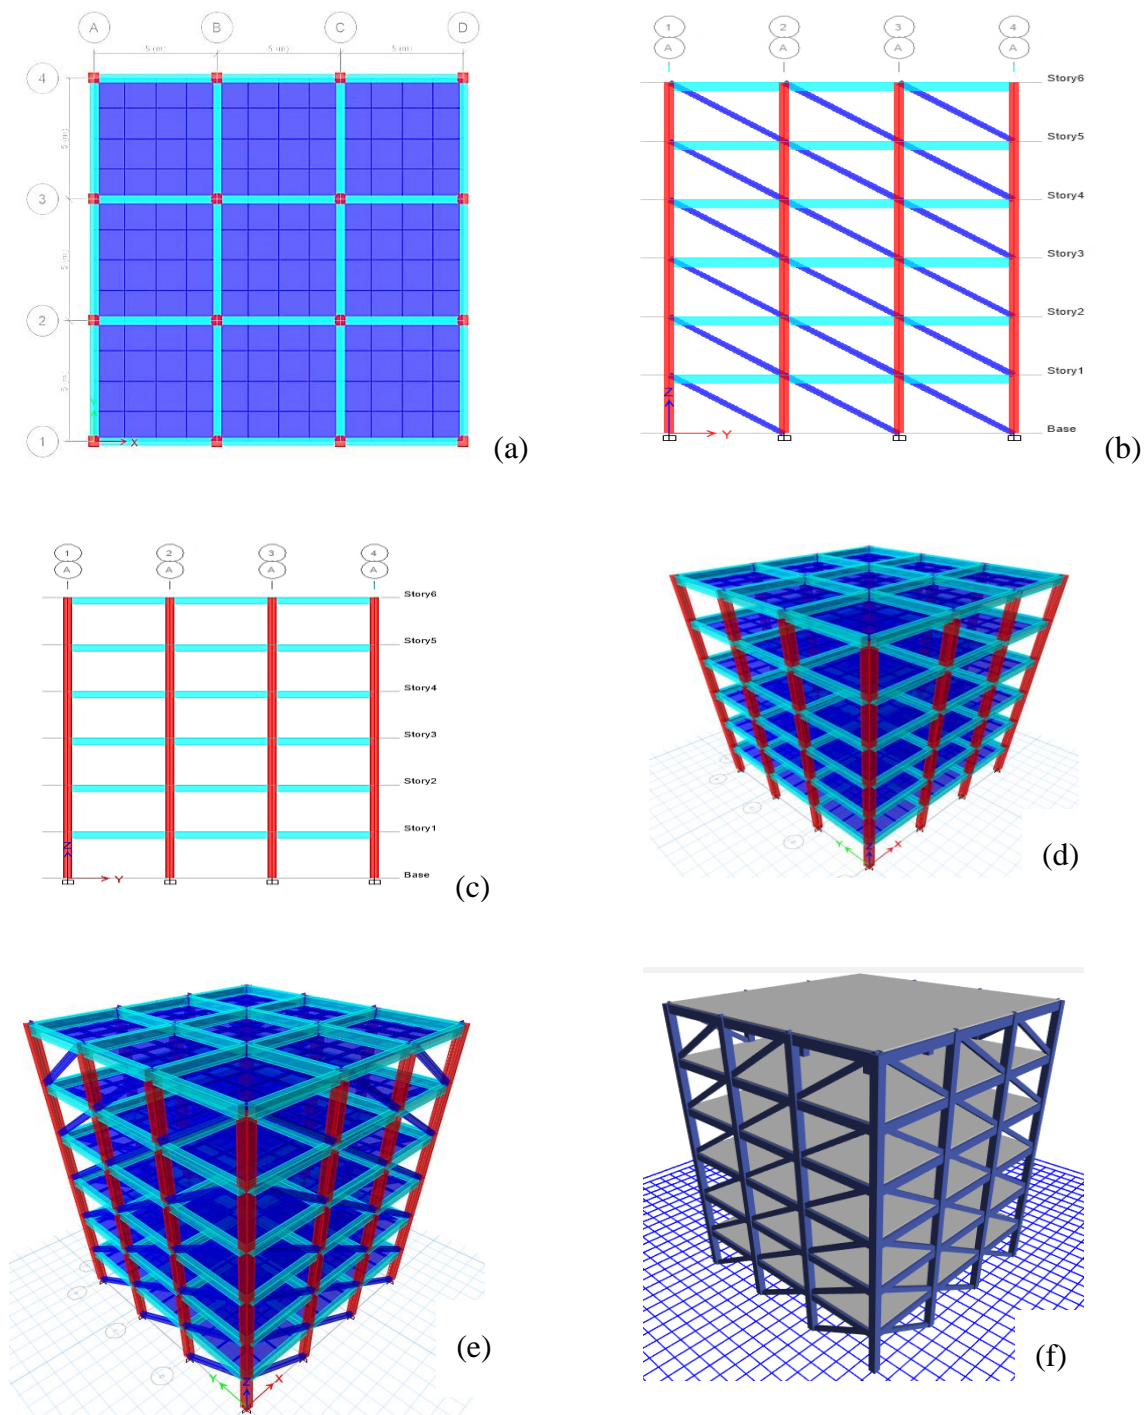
(a) Typical plan, (b) Elevation of regular frame, (c) Bare frame elevation, (d) 3-D bare frame, (e) Regular 3D model and (f) Rendered view 3D regular frame
